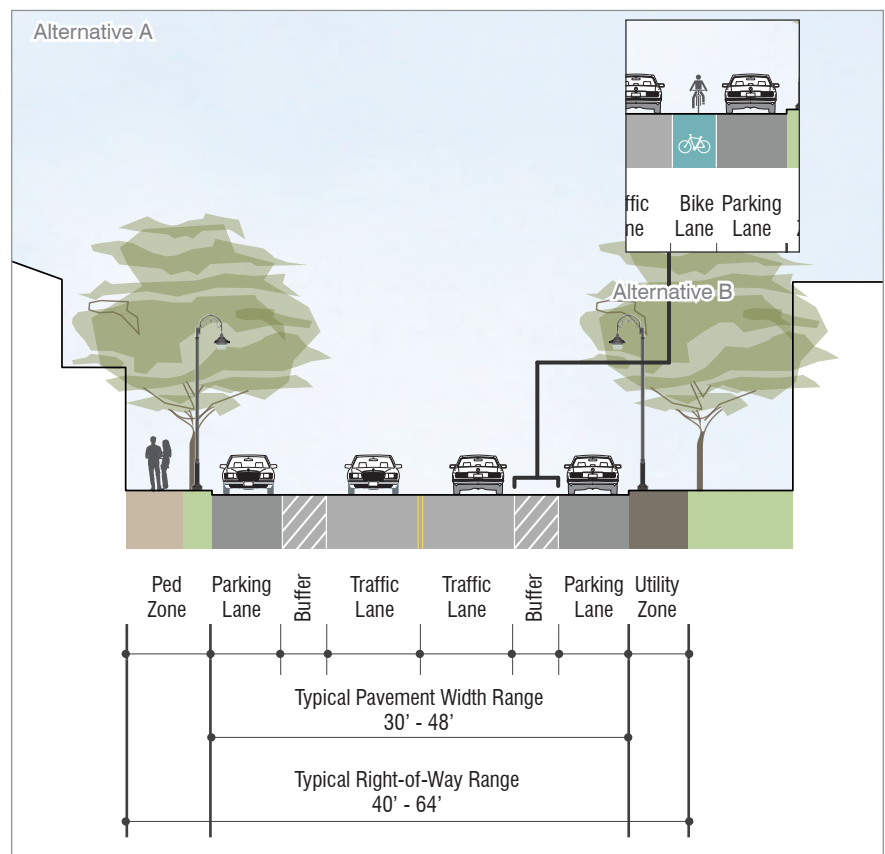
Typical Existing Street Section for 'Suburban Township Street' Typology
